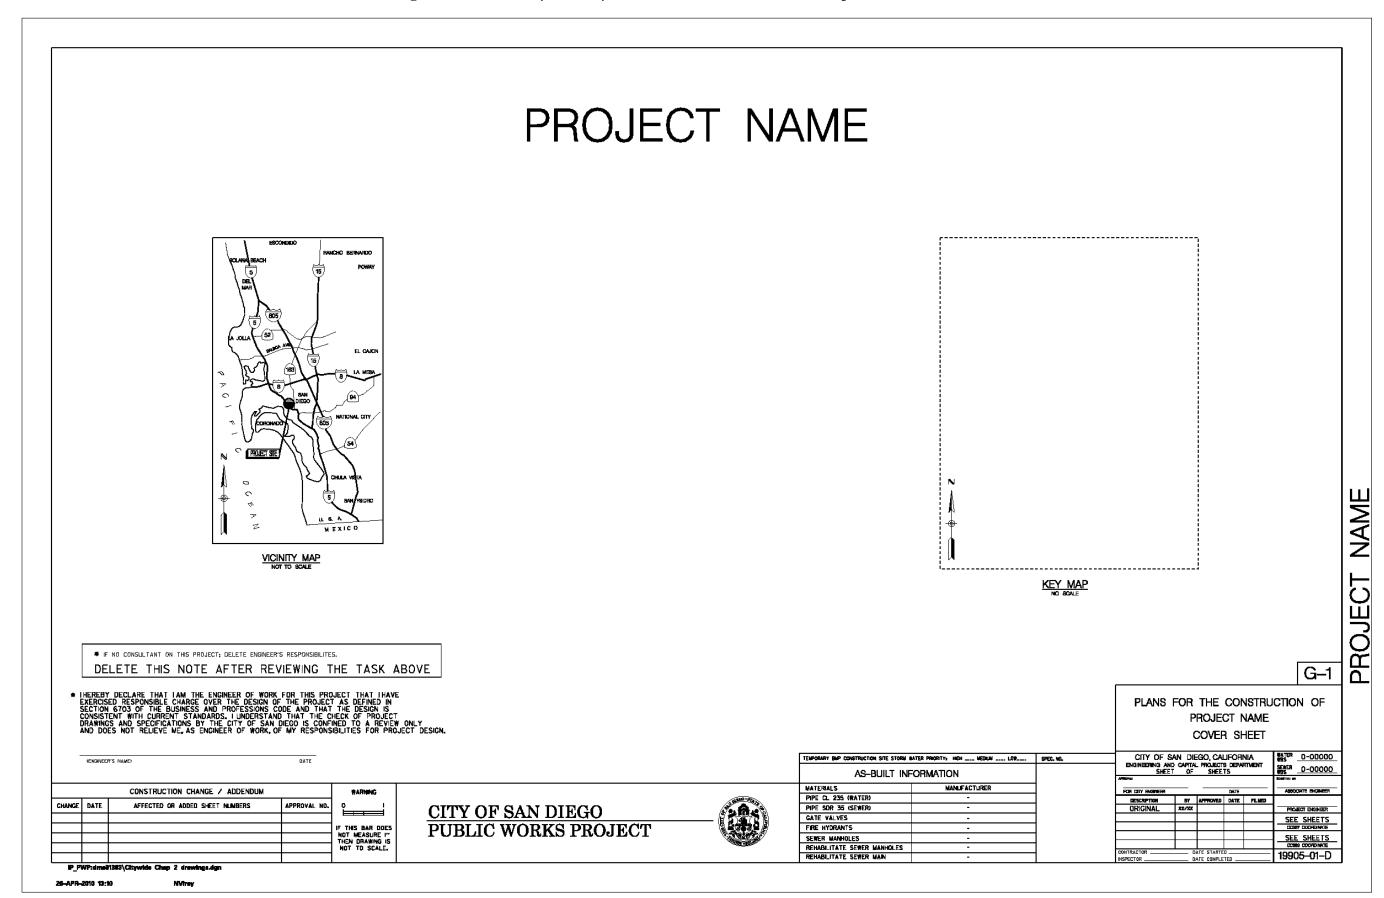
Sewer / Water / Storm Drain Cover Sheet 2 Samples
